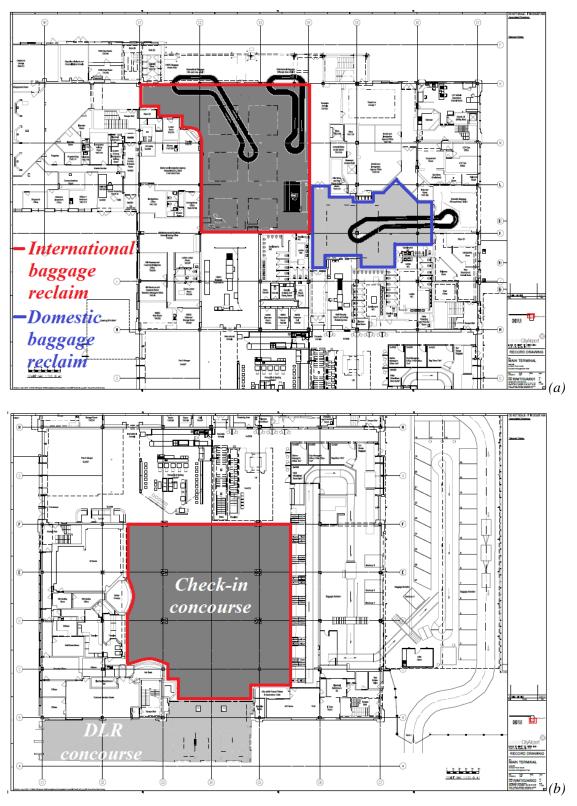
LCY ground floor plan (a) north: international and domestic baggage reclaim areas and (b) south: DLR and check-in concourse.
